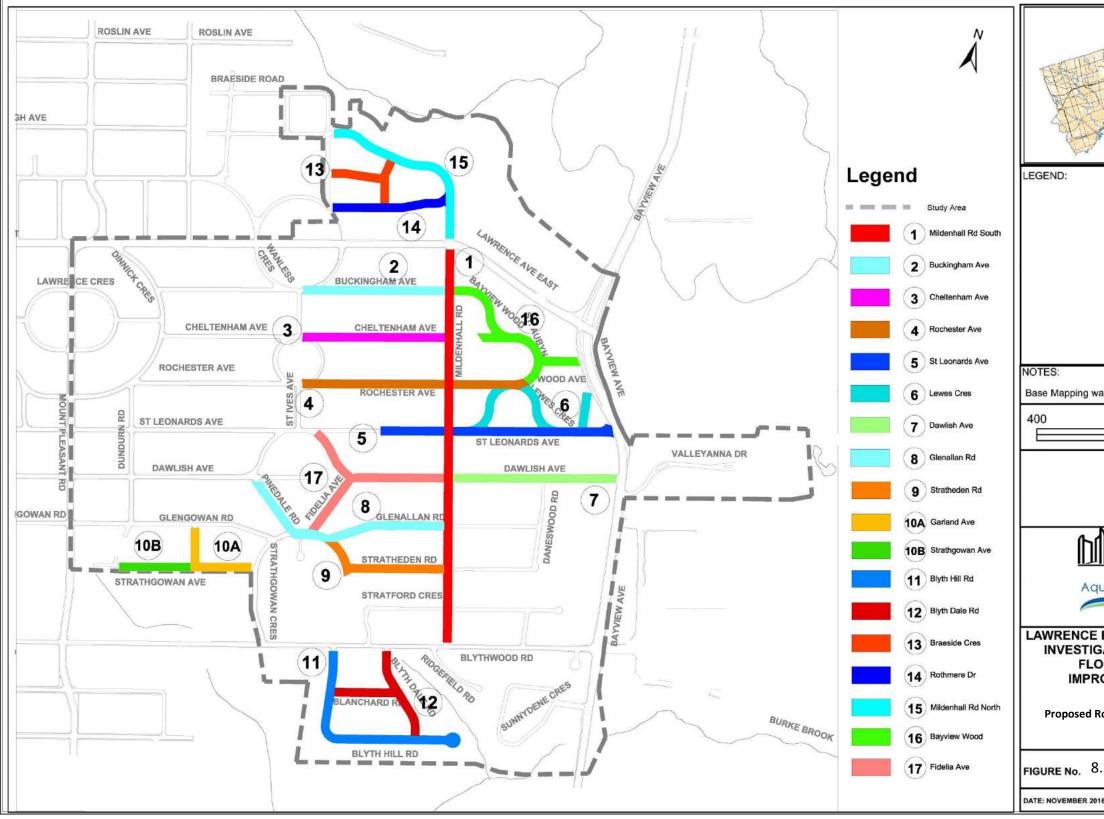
Locations of Proposed Road Reconstruction Projects
